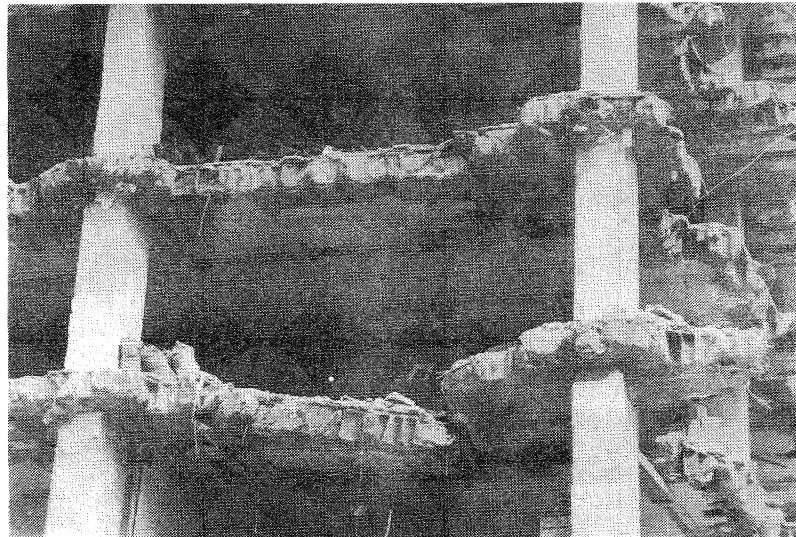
Flat slab-column joint failures, Public Water Supply building.
